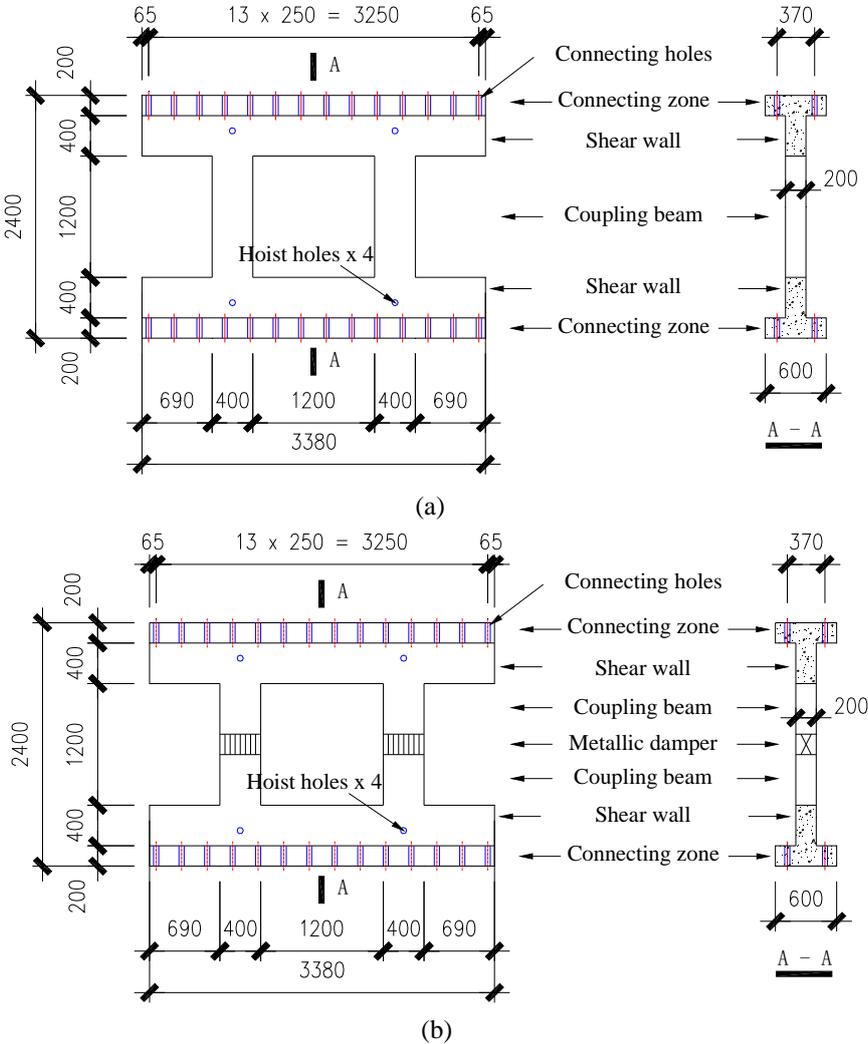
Specimens: (a) Traditional coupling beam; (b) Hybrid coupling beam
